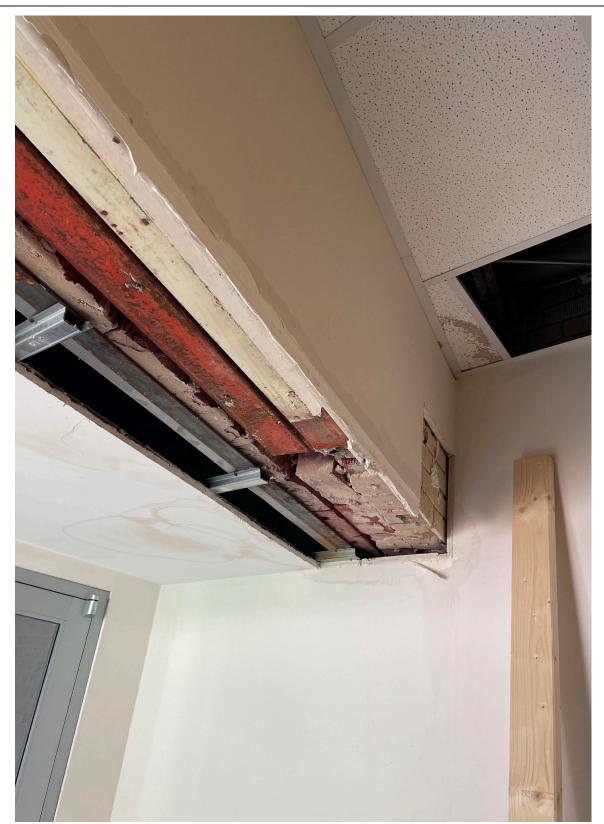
Weldon Auditorium: Additional view of existing orange steel lintel and unsupported masonry.
